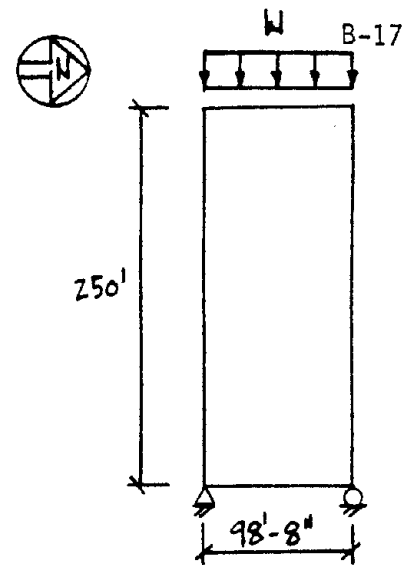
Roof Diaphragm Period, North-South Direction Earthquake, 120 Mast Street Building
